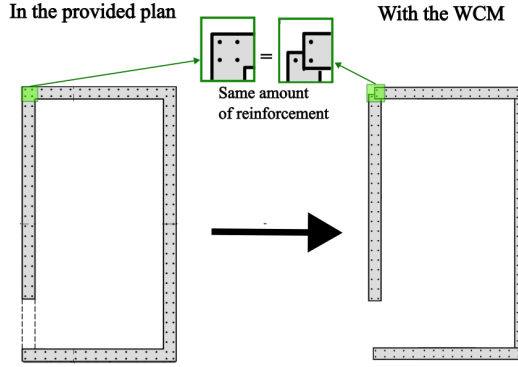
Equal distribution between the two wall elements of the reinforcement in each core's corner, example with core #4.
